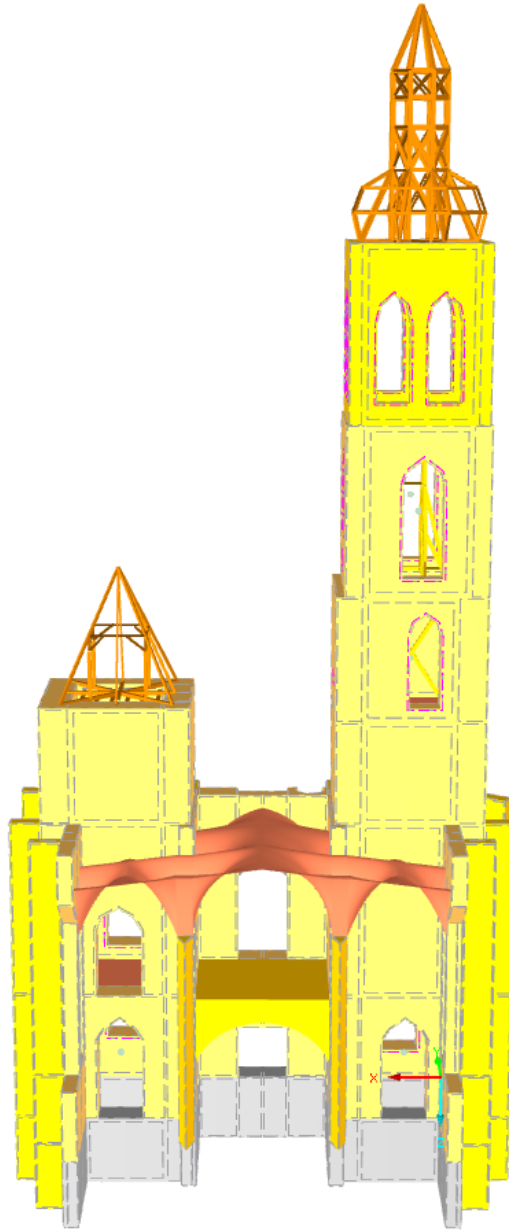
Dlubal 3D model of both towers, interior viewpoint with simplified choir and supporting arch modelled as high quality masonry made of 2D elements connecting the two towers.
